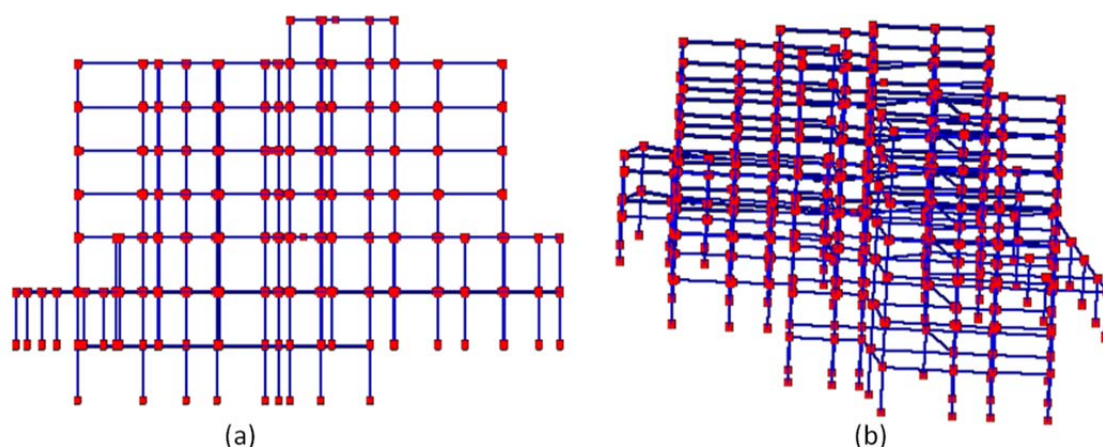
3D FE model for the whole structure: (a) 2D view in the X-Y plan, North (right) and East (left) wings; (b) 3D view.
